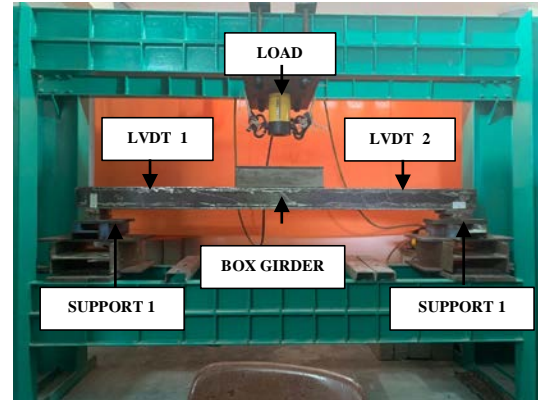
Schematic diagram of the laboratory girder of arch bridge model.
